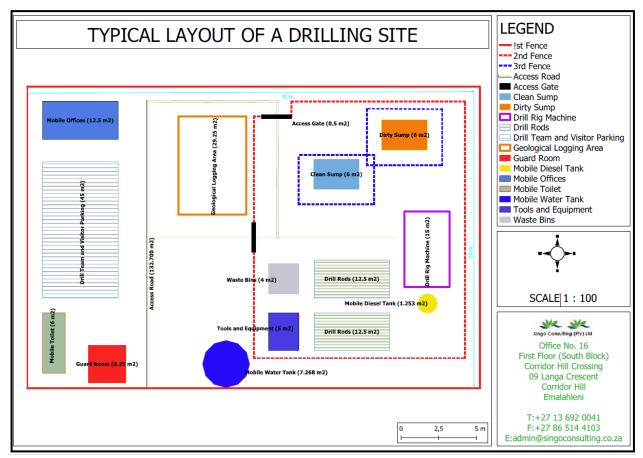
The drill site layout plan showing areas where specific activities will take place in the project area.
